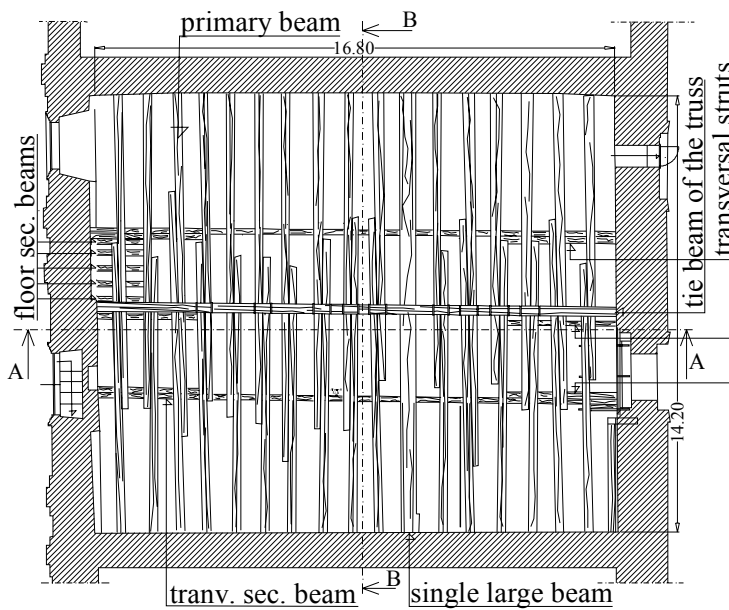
The principal bearing structures of the timber floor having span length higher than the ordinary one.
